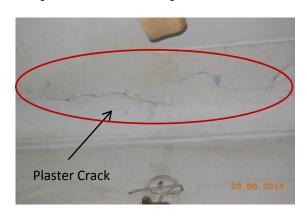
Plaster Crack on Roof of Shop No. 773-3, Ground Floor
